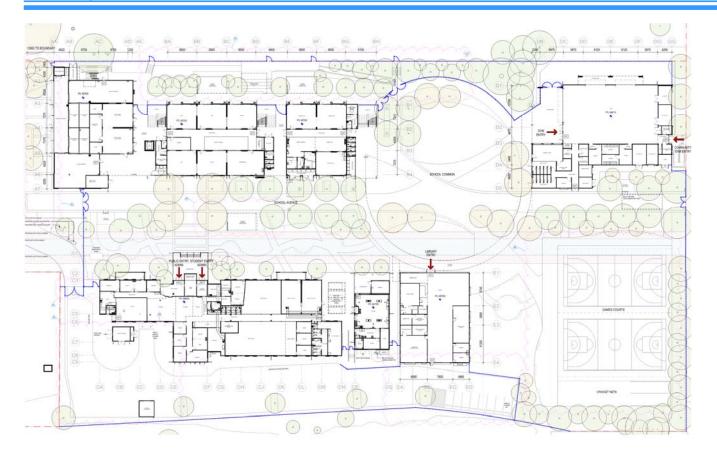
Proposed Architectural Ground Floor Plan for BHS (Source: TKD Architects)
